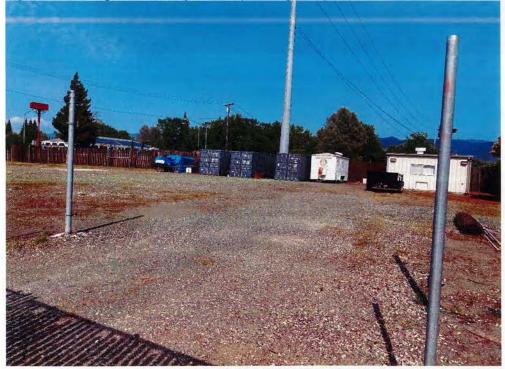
, Existing View of Project Site from South Orchard Avenue (Looking East)
